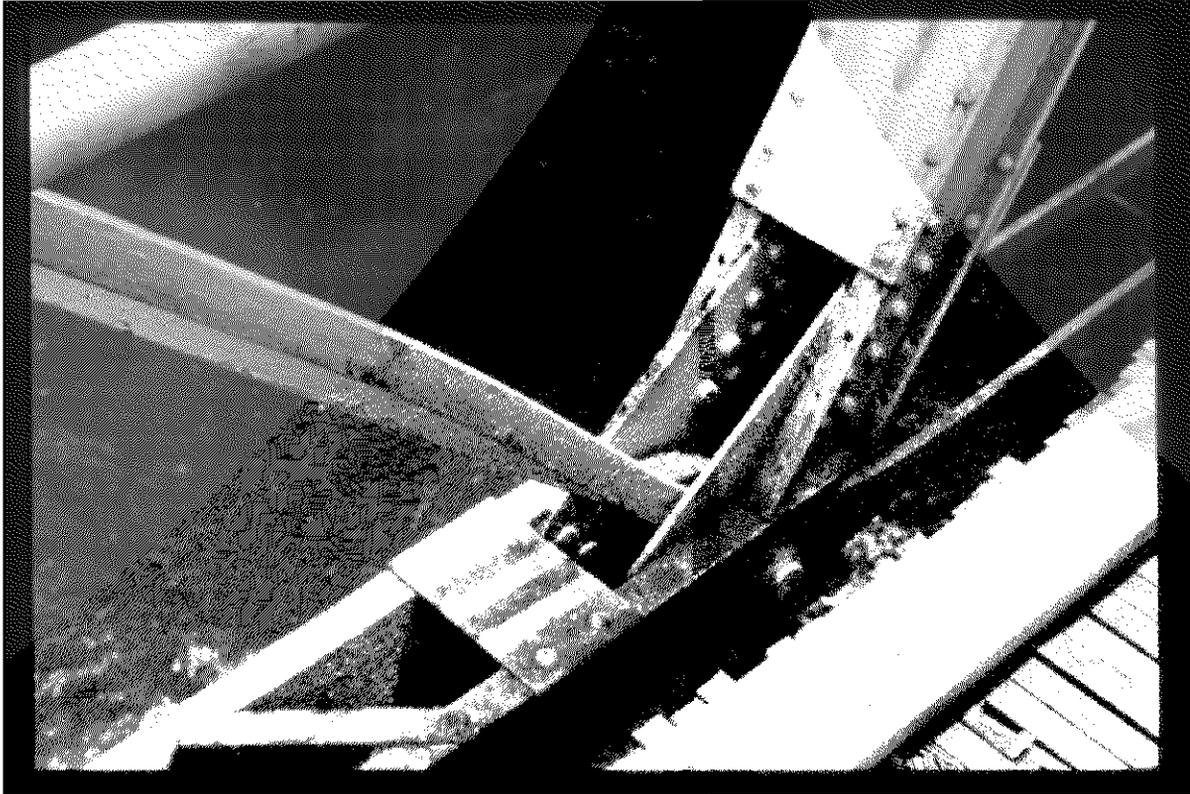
The western segments of the bridge are joined by rivets and pin construction methods. Field photograph.
